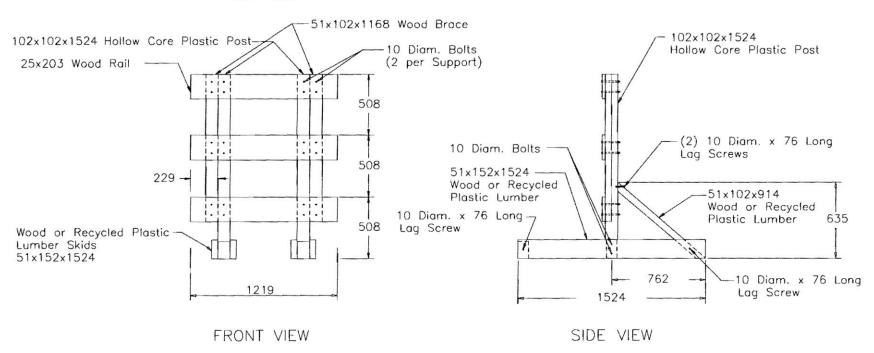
Test No. 439107-1 Type III Barricade (*15*)
